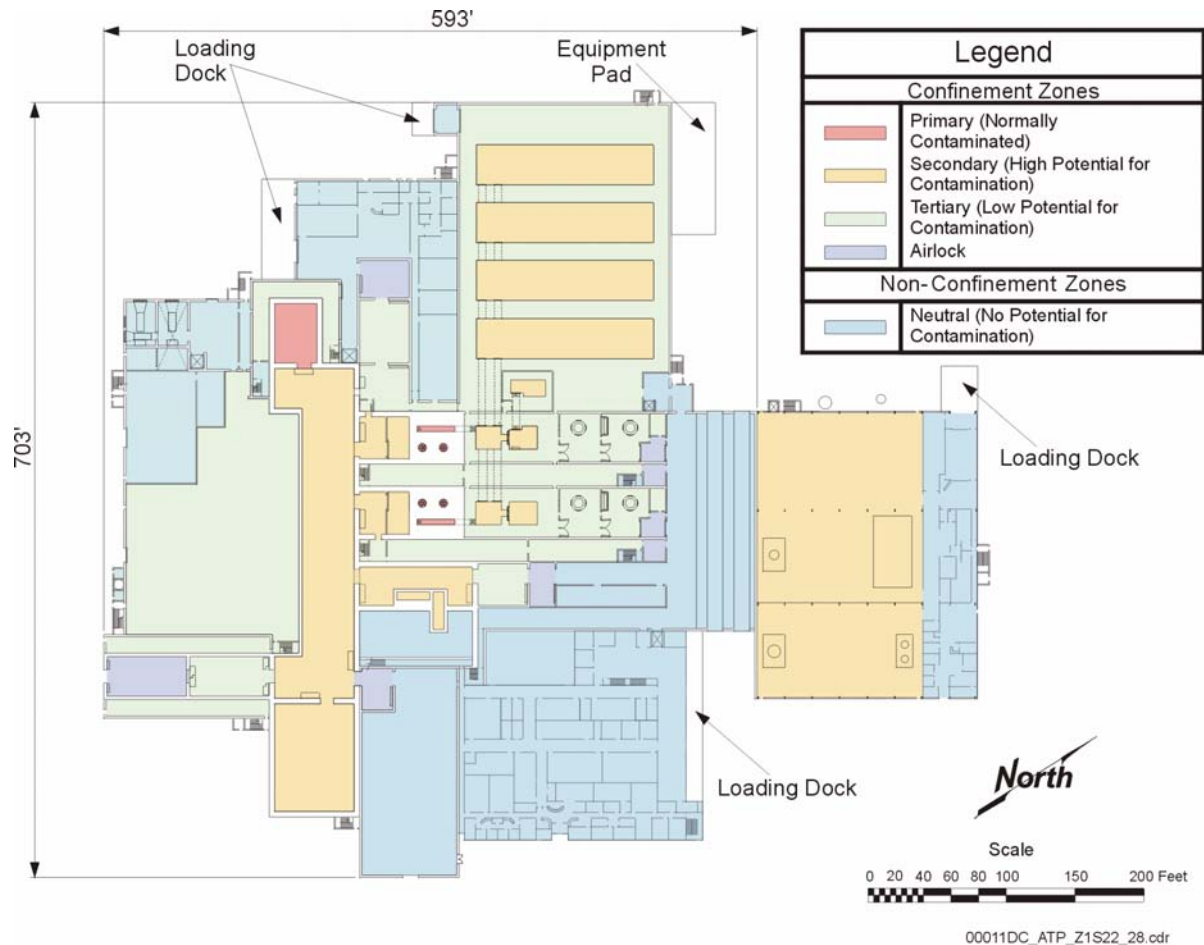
Waste Handling Building Confinement Zone Configuration
